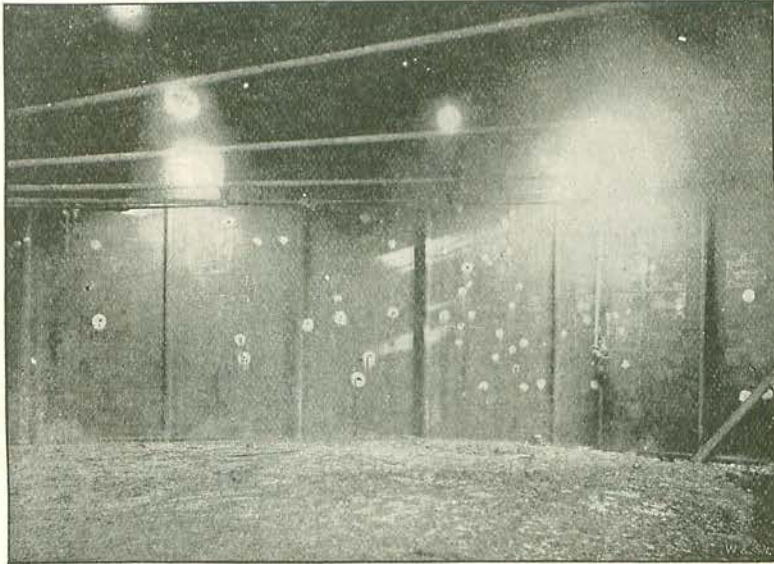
THE GLASGOW EXPLOSION—INSIDE THE GASHOLDER.
